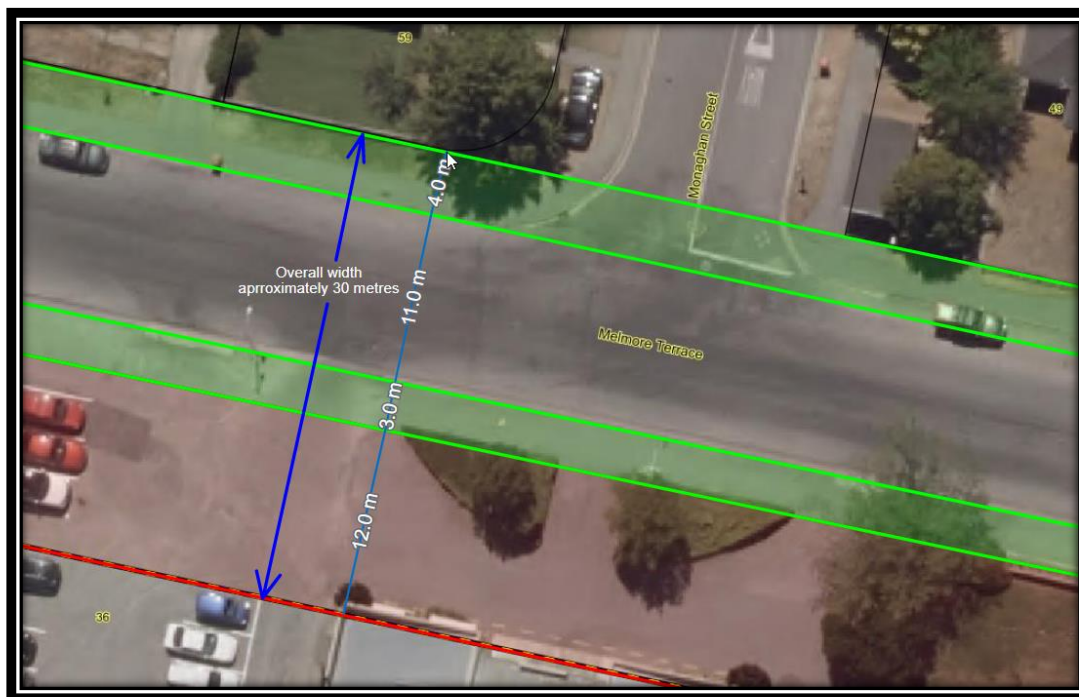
Overview of the Legal Road Width in Front of the Hall
